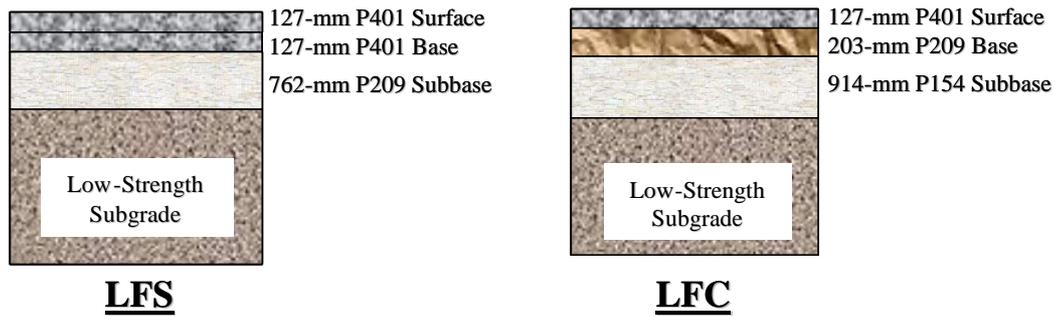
The NAPTF pavement cross-sections of LFS and LFC test sections
